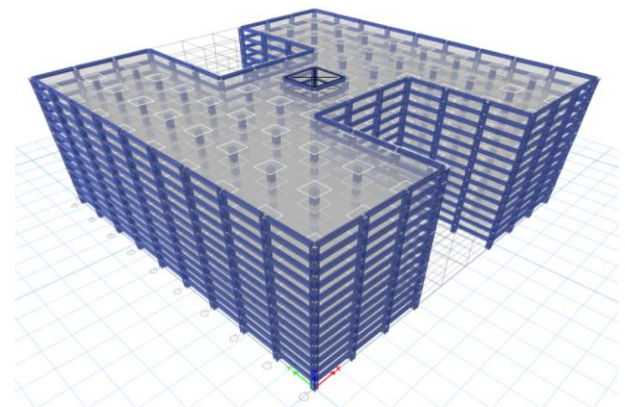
Typical floor plan for G+12 storey flat slab building without drop
